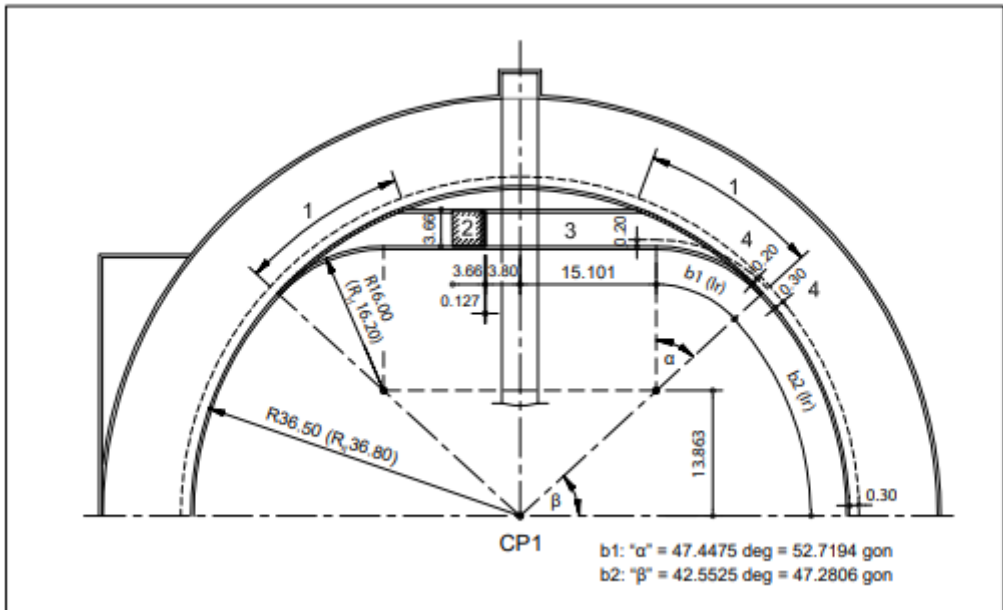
Water jump on inside bend (Dimensions in m)
